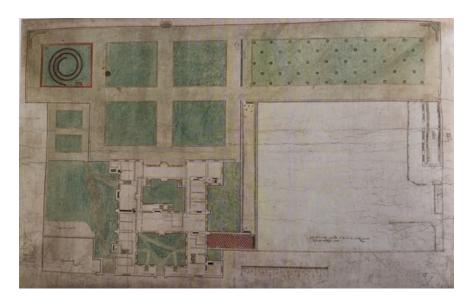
Plan of William Cecil's house in the Strand, London, 1562-5, from Paula Henderson, *The Tudor house and garden*, p.10.
